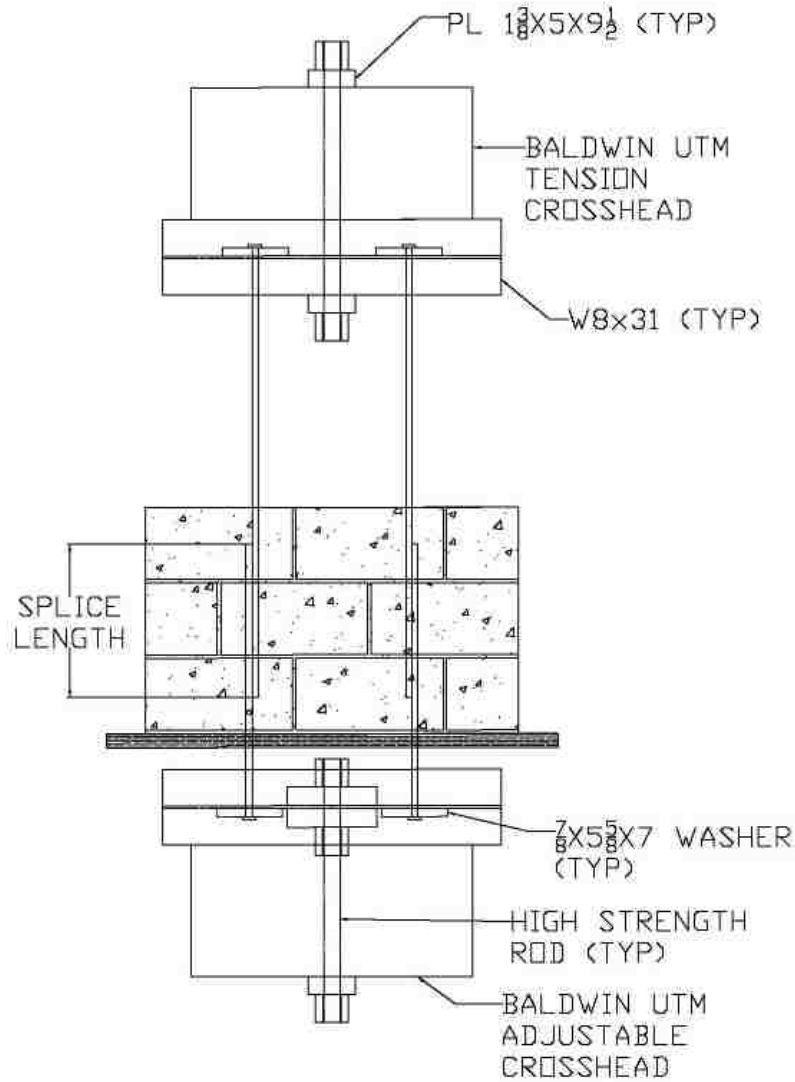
Reinforced Masonry Panel Testing Apparatus
